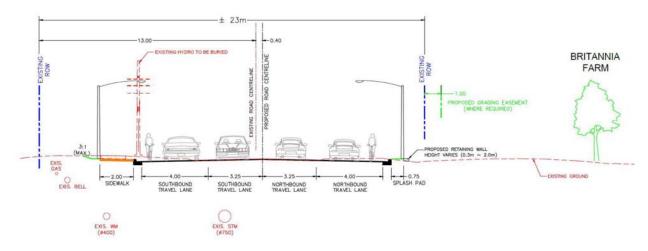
Typical Section - North of Bristol Road West (Sta. 10+420)
